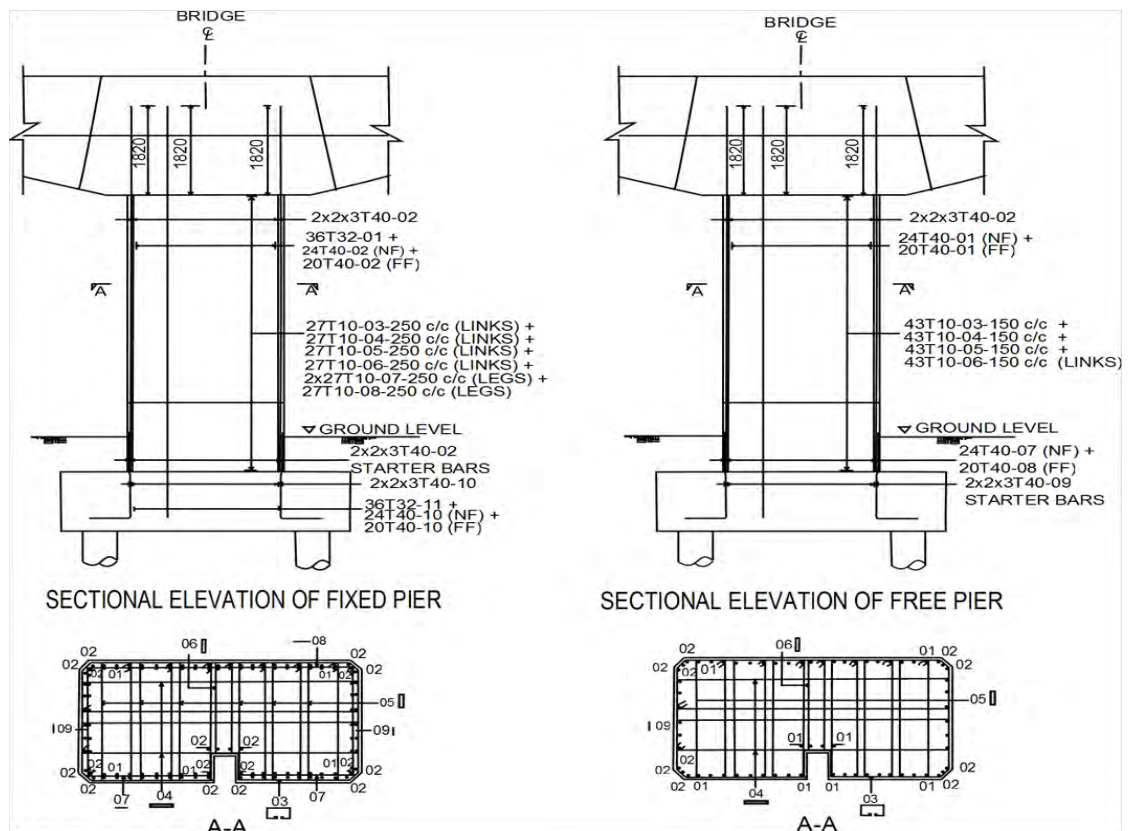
Sectional detailing of fixed (left) and free (right) piers.
